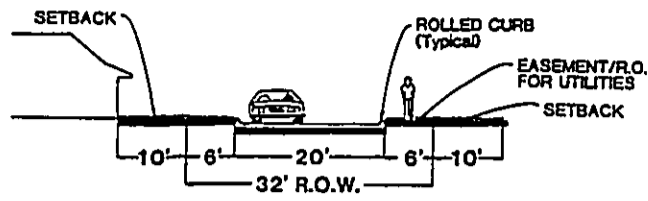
illustrates typical roadway sections being proposed for the Ewa Villages project. The roadways within the project can be categorized into two groups: neighborhood residential streets and main collector roads. In addition to these planned road improvements, there are other off-site roadway improvements that will be implemented as part of the overall project. These include: relocation of Mango Tree Road, construction of a segment of the East-West arterial between Kapolei and Ewa by Gentry, and the upgrade of the intersection at Renton Road and Fort Weaver Road. Proposed roadway improvements are discussed below:
